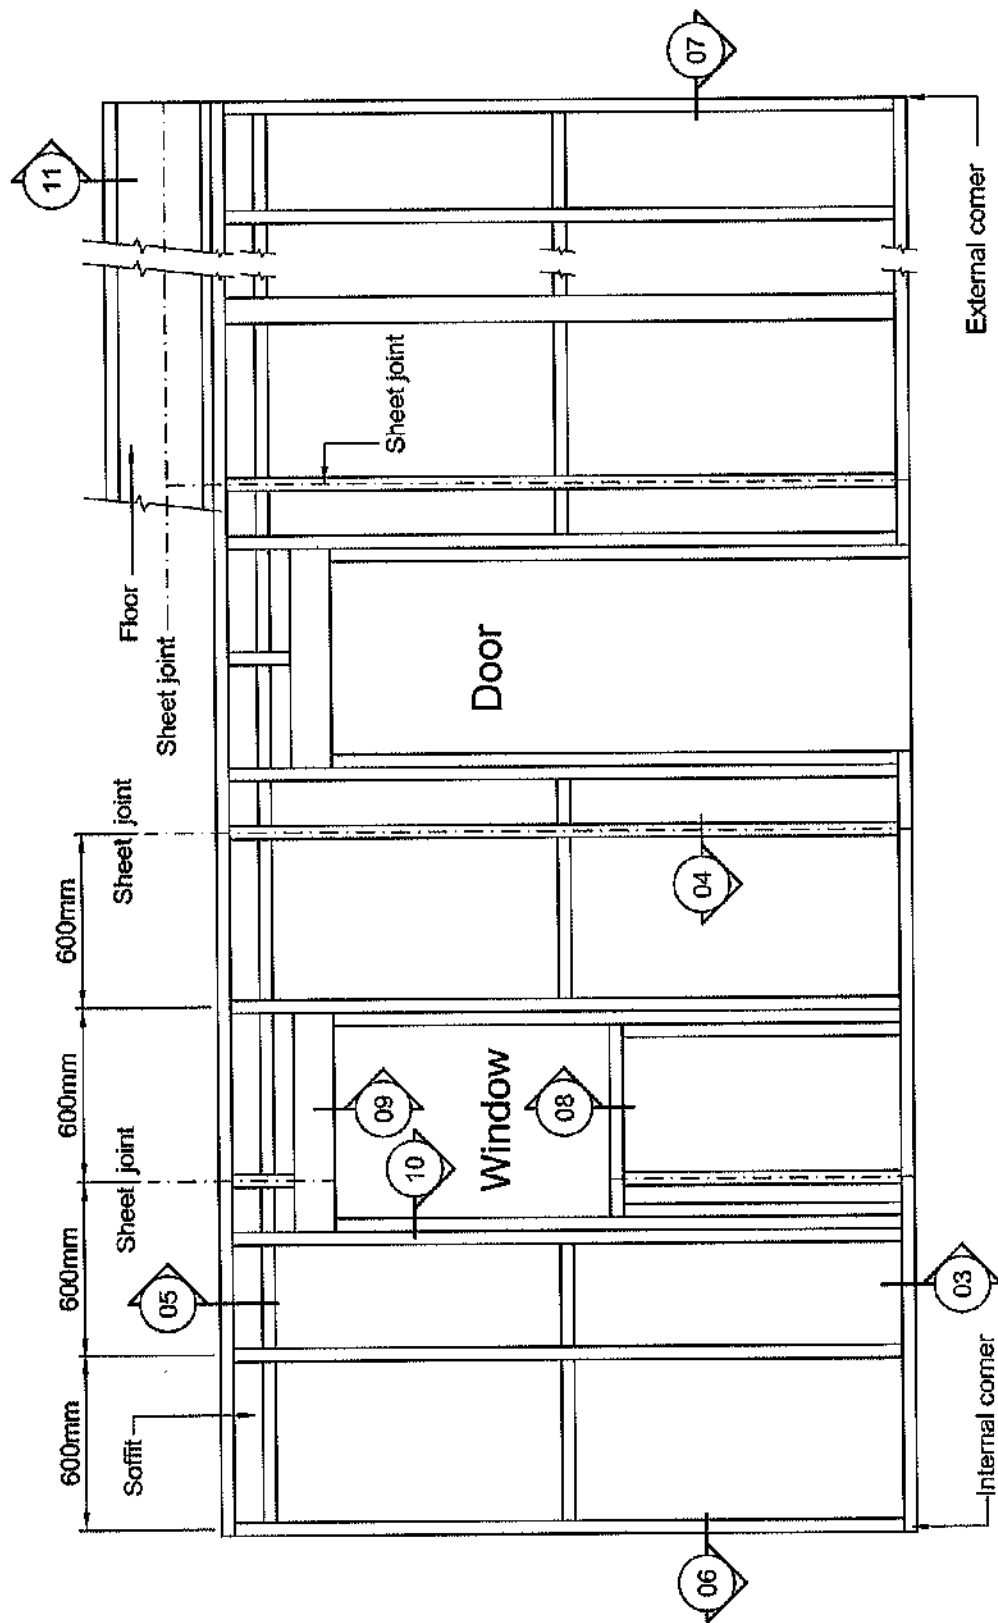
DIRECT FIXED TYPICAL FRAMING SETOUT
